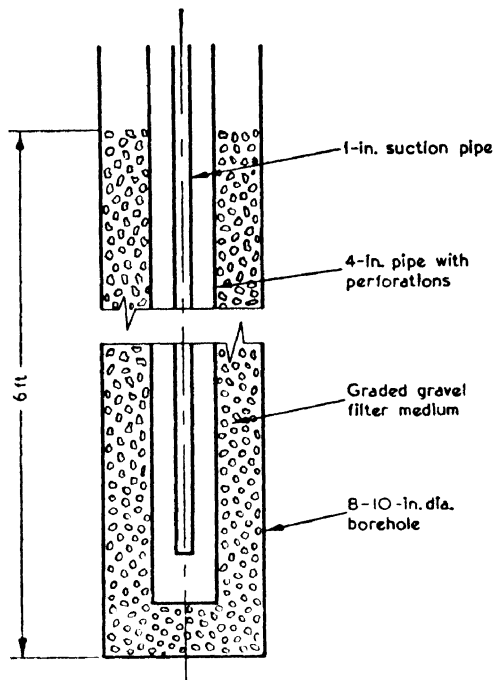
SECTION THROUGH FOOT OF WELL-POINT
